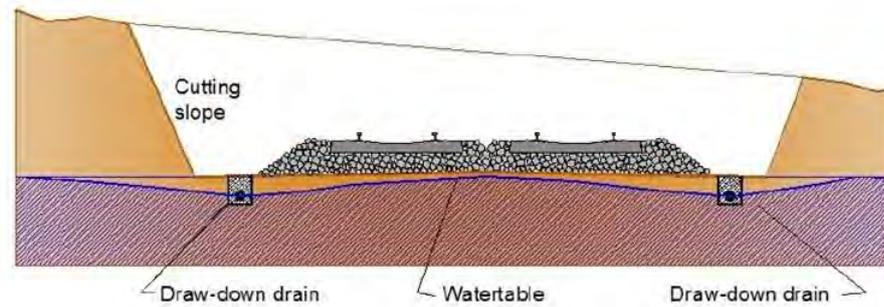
Pipe as a collector drain at cutting slope in a railway track section, source Tzanakakis (2013)
